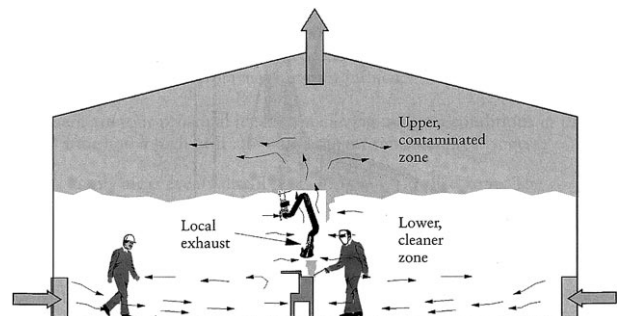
Displacement ventilation in a welding shop⁴⁾.
